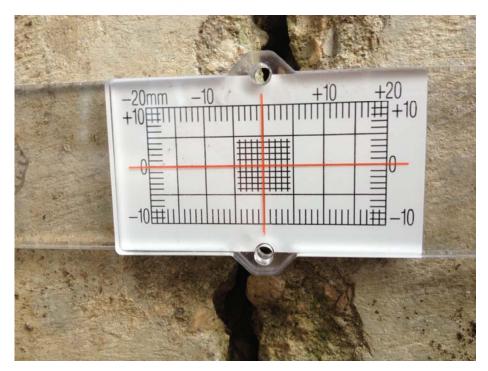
Crack Meter Located on the Retaining Wall Behind 306 Sask. Cres. E. (CM1) (Aug 12, 2013)
